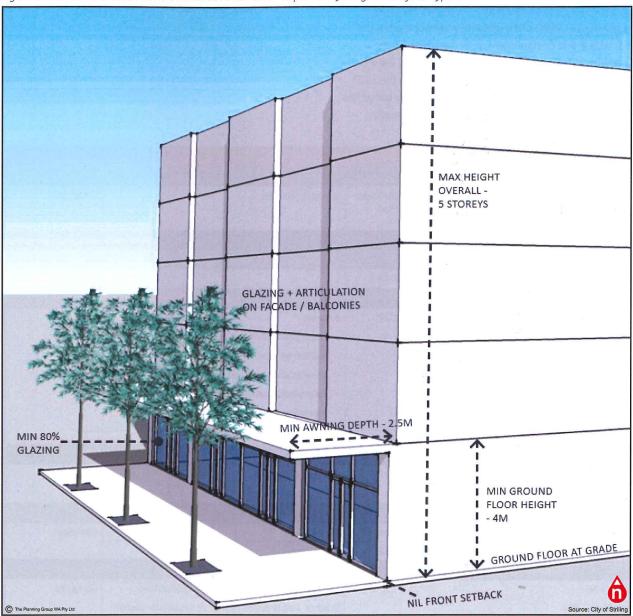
Mirrabooka Town Centre Detailed Area Plan – Explanatory Diagram Façade Type C
